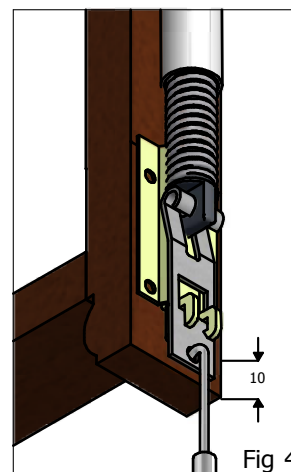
Fix UK121 to horn before sash is in place (Penetration of screws should be 10mm minimum). When sash is fitted, UK120 is slid into UK121 as shown, and its bottom edge should be 10mm above the bottom of the horn.
